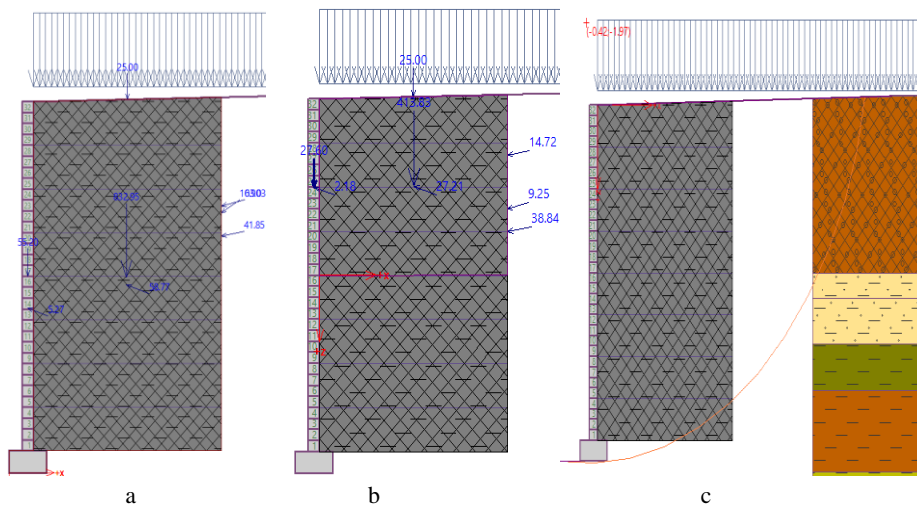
Verification of: a- overturning; b- slip on georeinforcement; c- global slope stability analysis for a reinforced earth retaining wall.
